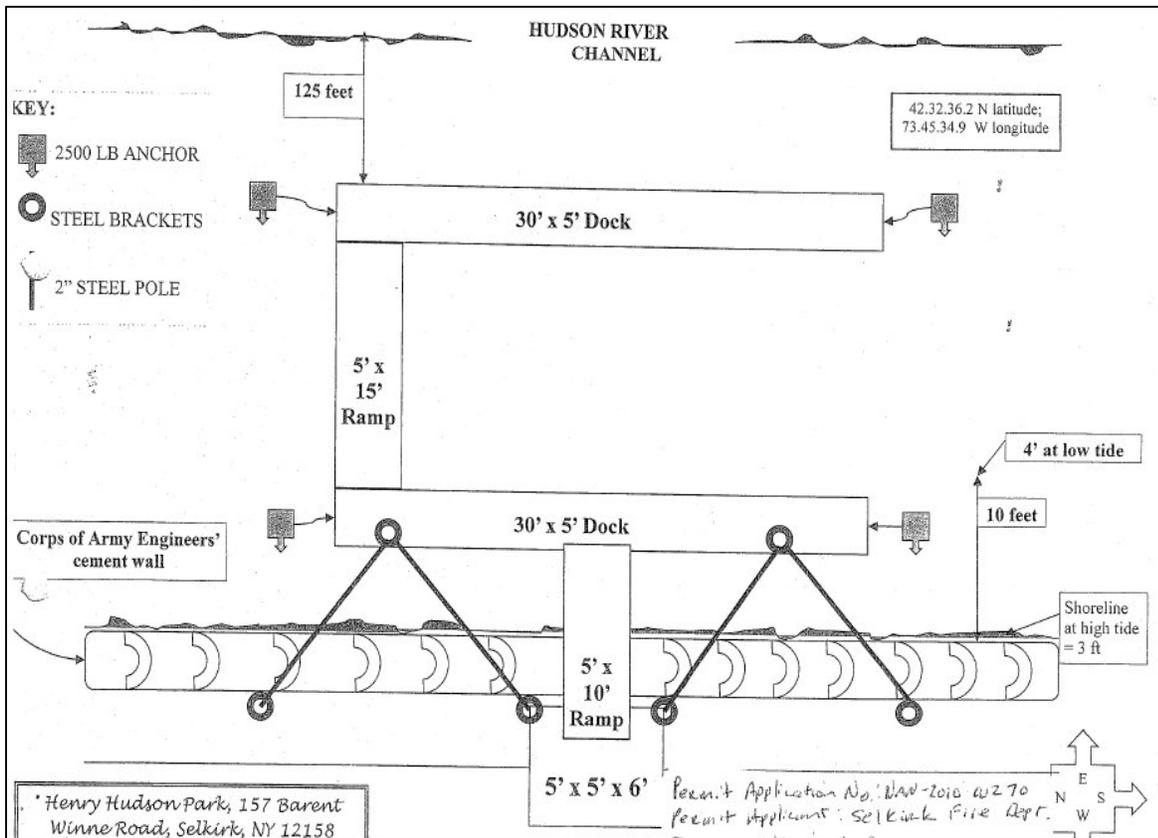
Fire Dock Arrangement as depicted in Permit Application
